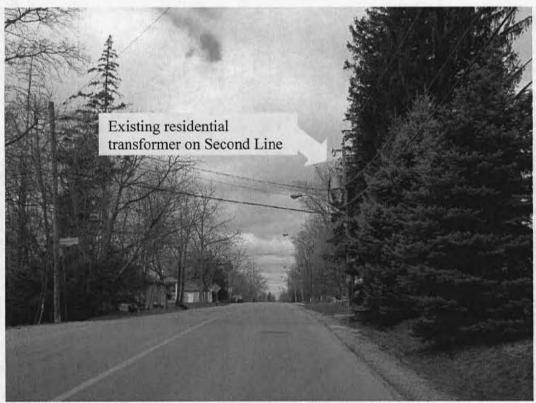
Typical 45 foot wood pole installation with primary conductor (16 kV)
